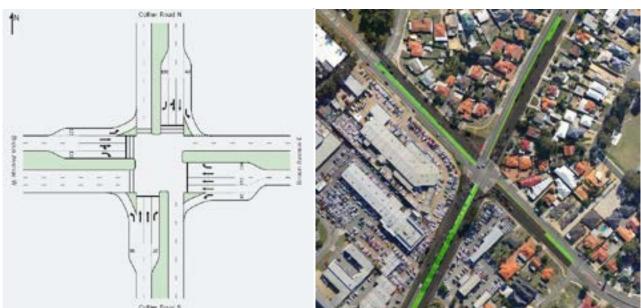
Broun Avenue/ Collier Road – Mitigated Geometry
